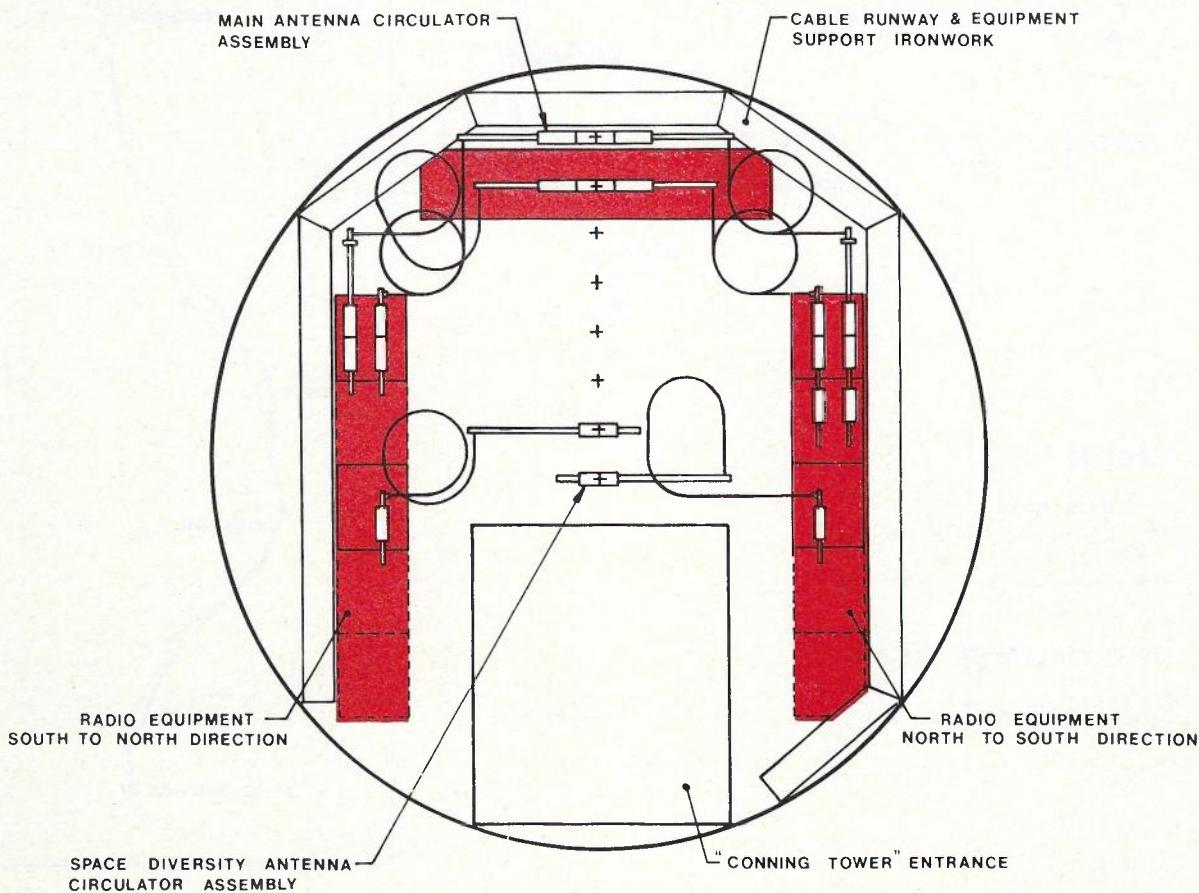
Repeater Station: Layout of Equipment in Underground Shelter.
